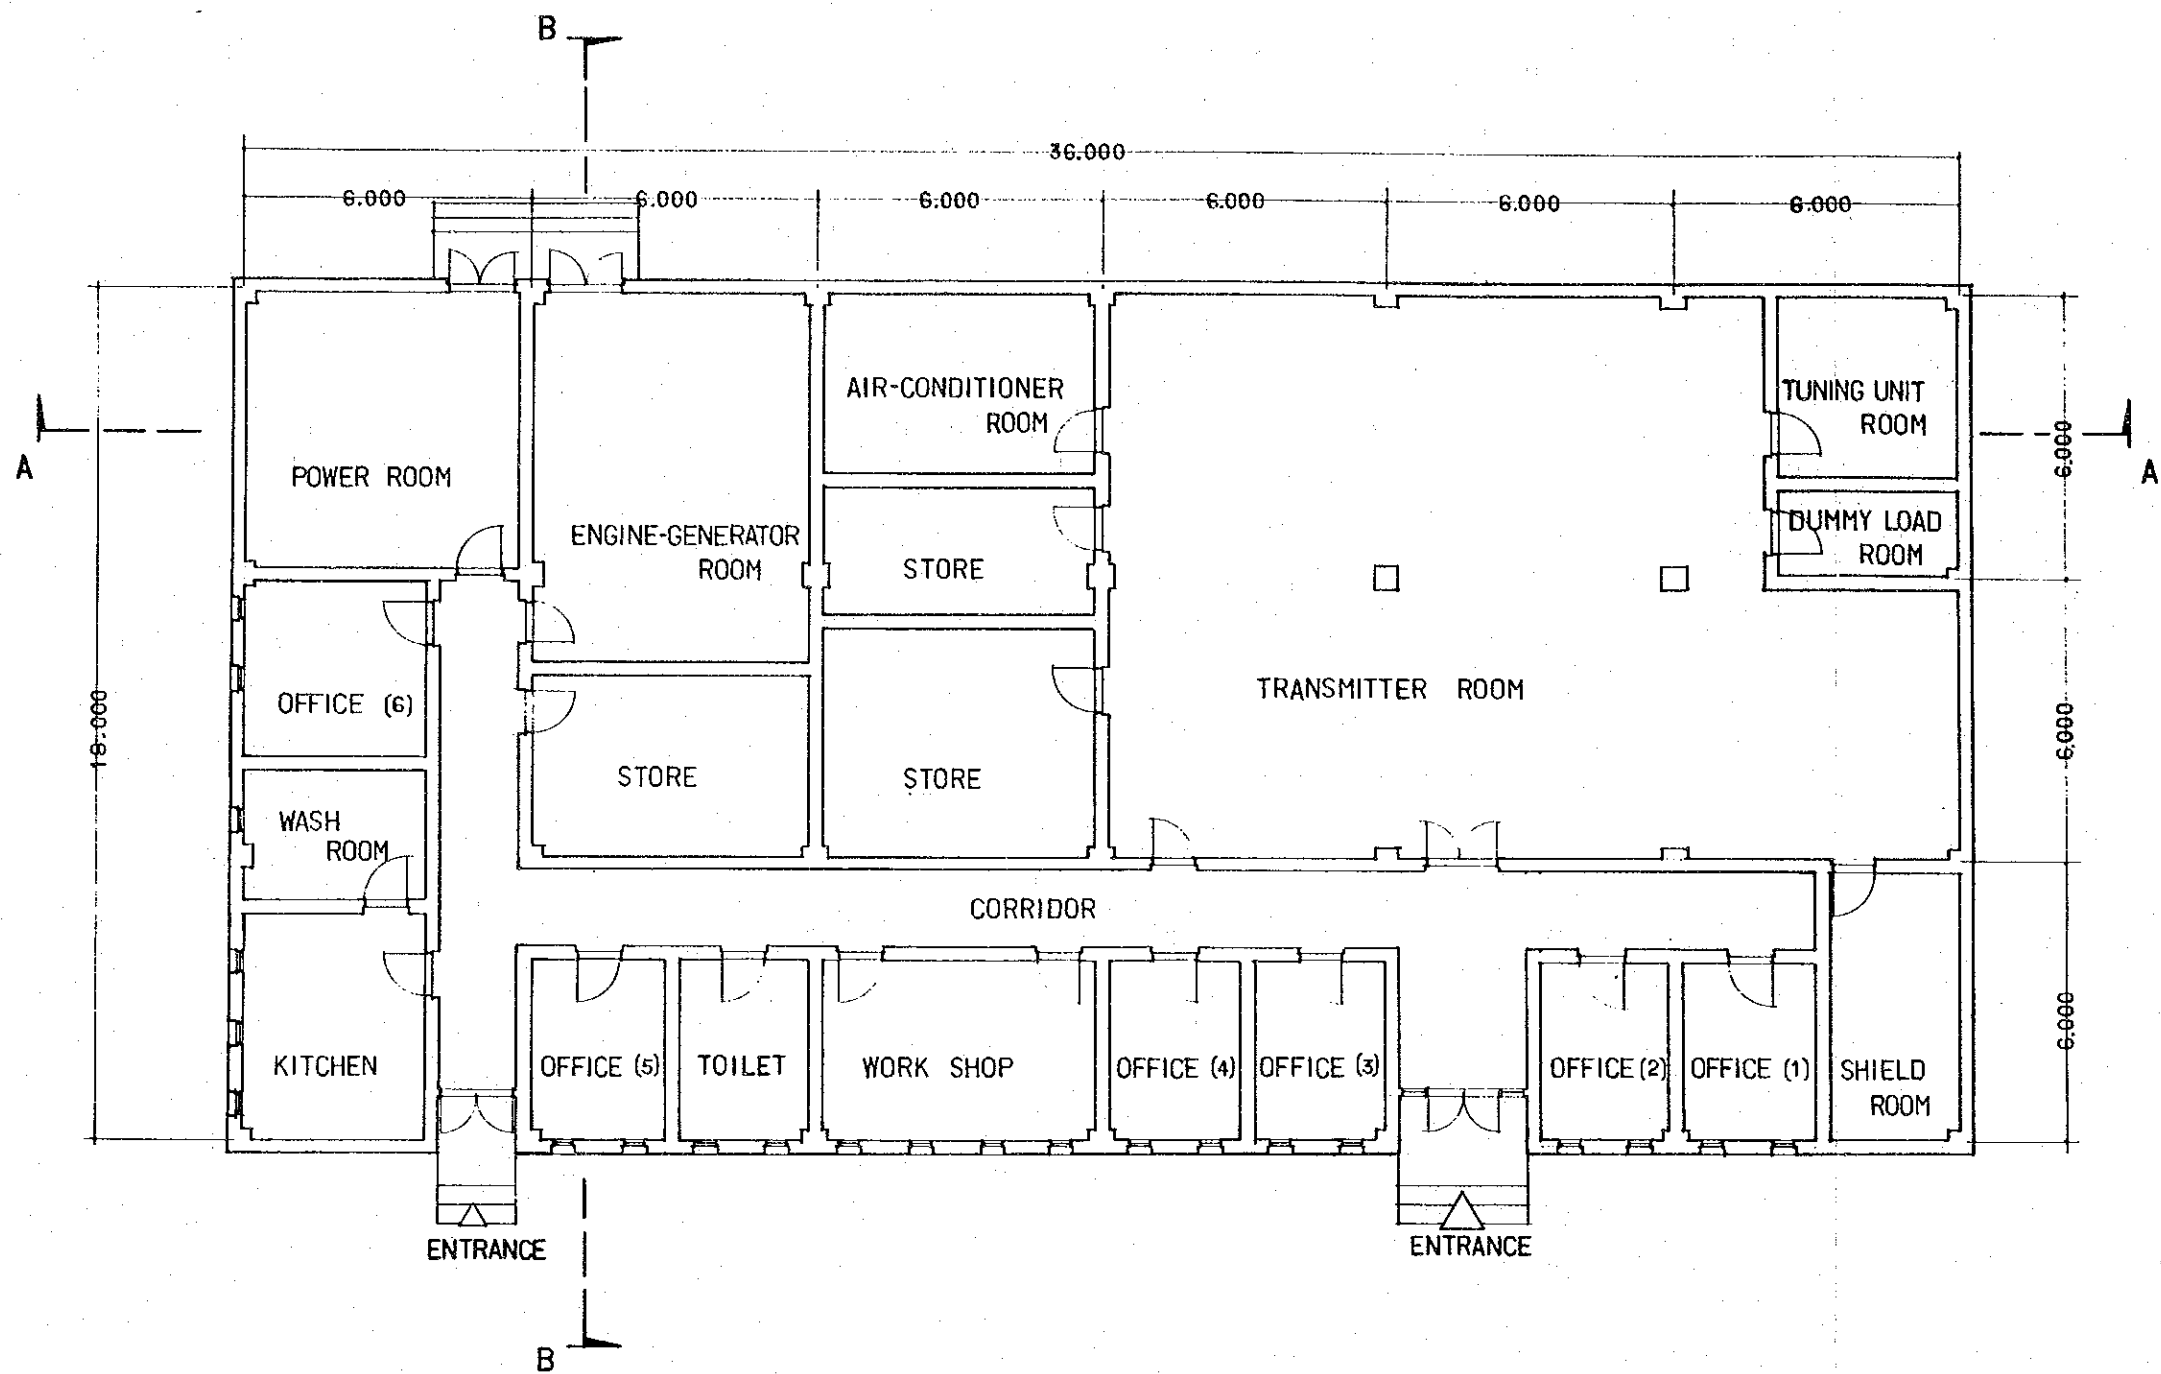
FLOOR PLAN — KATHMANDU TRANSMITTING STATION
